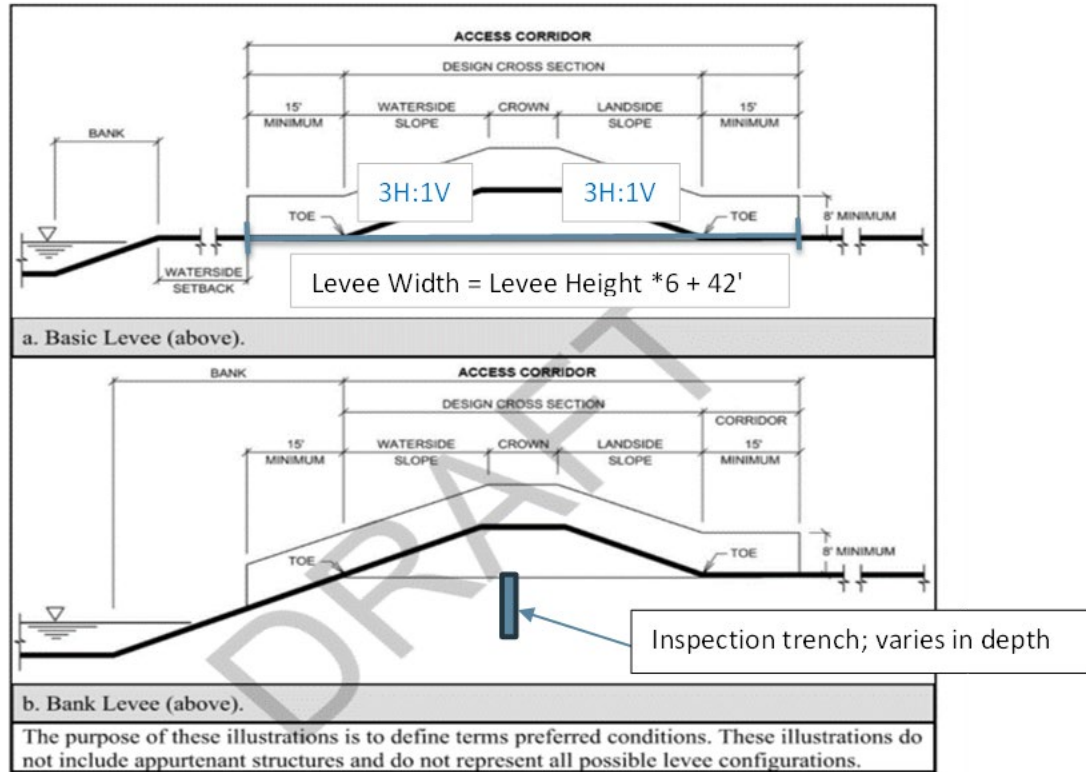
Typical Earthen Levee Cross Sections (USACE, 2023) with annotations by GeoEngineers
